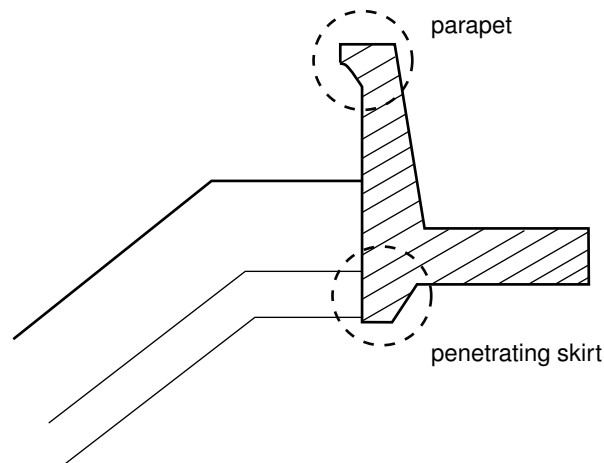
Crown wall with a horizontal (parapet) and vertical extension (penetrating skirt) [PEDERSEN, 1996]
